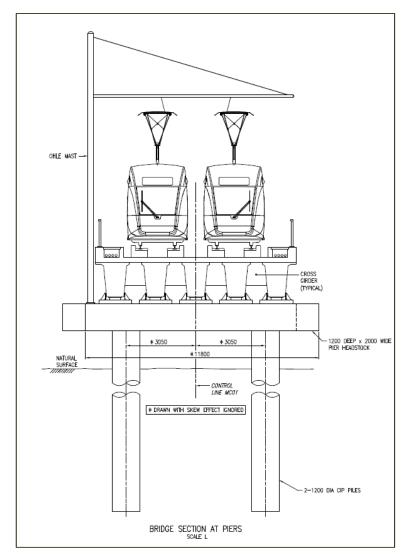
General cross-section view of the Coombabah Creek Bridge Crossing
